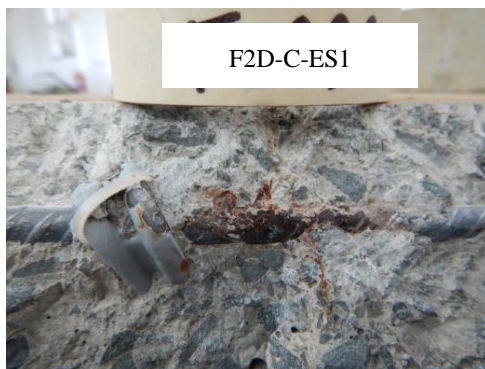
Photographs of corroded reinforcement bars in cracked PC/FA concrete (contd.)
